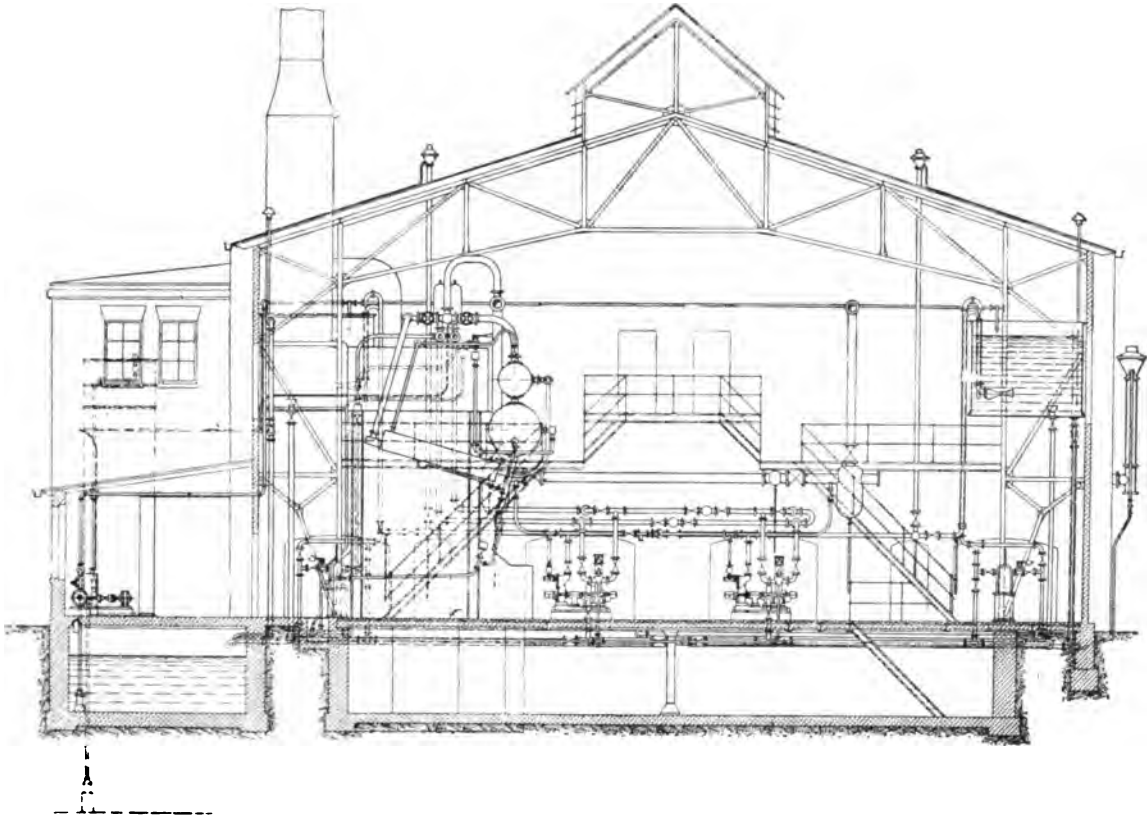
Section through Boiler House looking towards the Engine Room.
